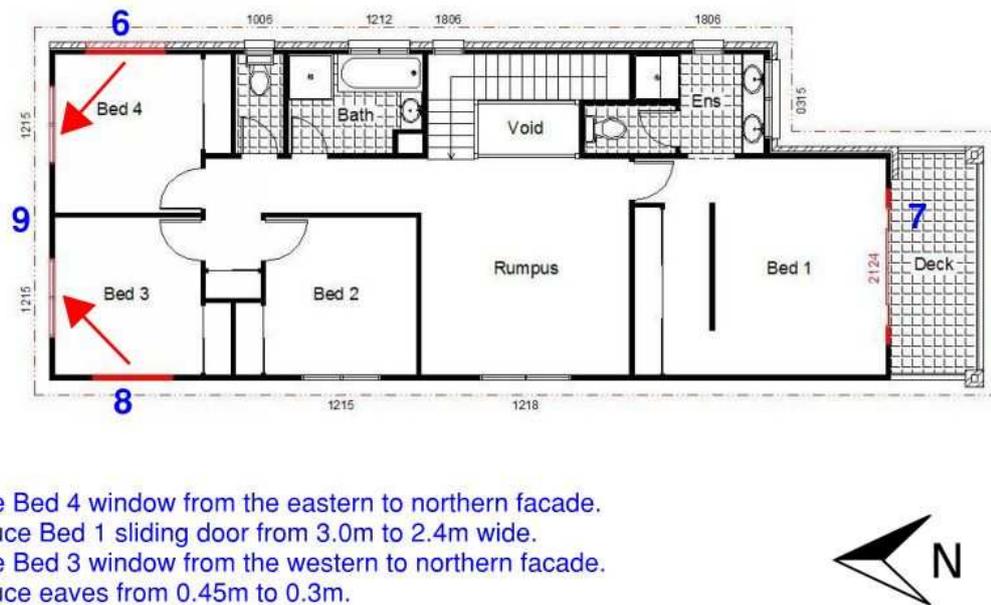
Redesigned first floor plan of Dwelling 8 in Darwin.
